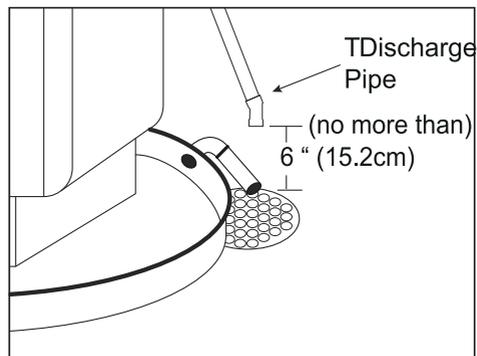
The end of the T&P Relief Valve discharge pipe must stop no more than six inches above a floor drain or terminate outside the building.
